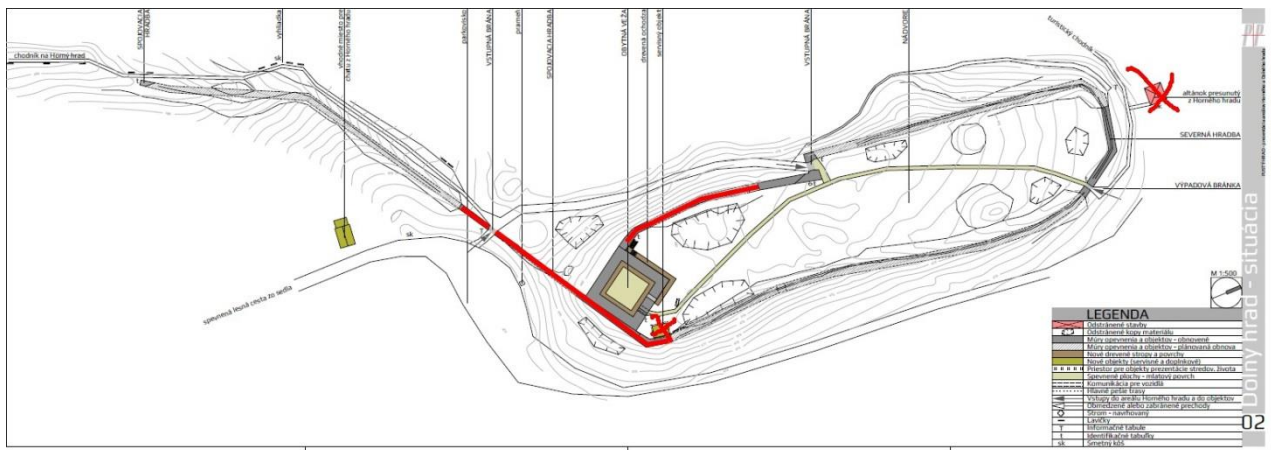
Ground plan from architectural study of restoration of the lower part of the Castle Pustý Hrad in Zvolen by Ing. arch. Miloš Pivko. Grey – already finished work, red outlined – planned work, x – denied building activities.
